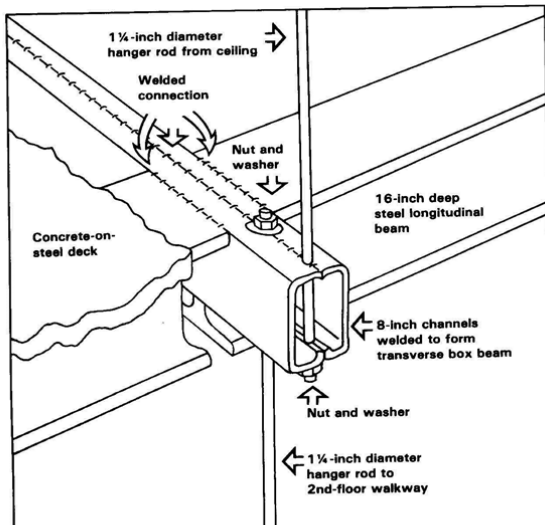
Typical fourth floor Box Beam-Hanger Rod Connection
